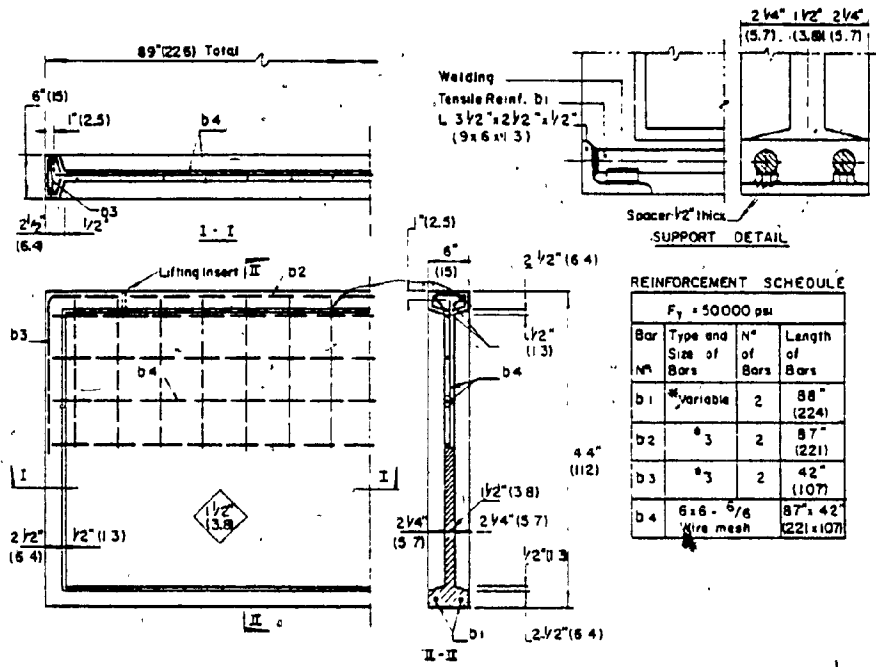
Typical Thin-Wall Panel - Dimensions and Reinforcement Details
